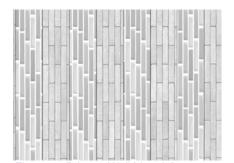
Primary Wall Material -Vertical Stacked Brick
